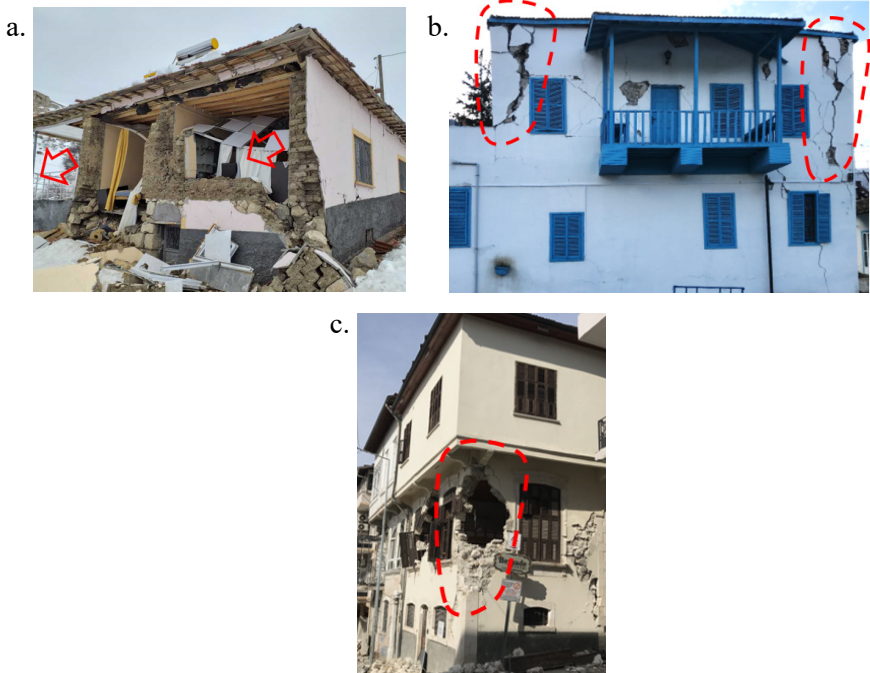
a. Wall-to-wall connection failure b. Corner failure along with in-plane damages c. Partial collapse due to lack of corner connection and in-plane damages
